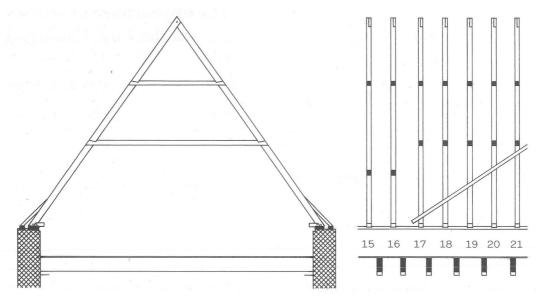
Drakenburg House, Oude Gracht 114 Utrecht 1291 (d). (Drawing L.M. de Klein RDMZ)
